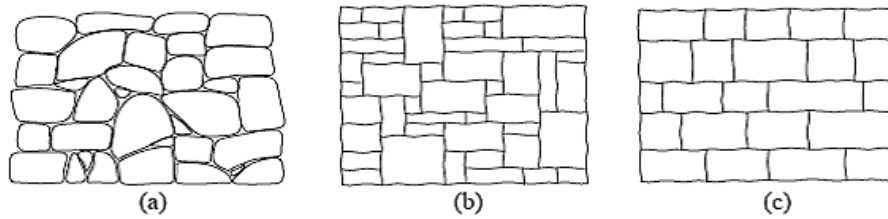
Different types of masonry: a) rubble masonry, b) ashlar masonry, c) coursed ashlar masonry [7]
